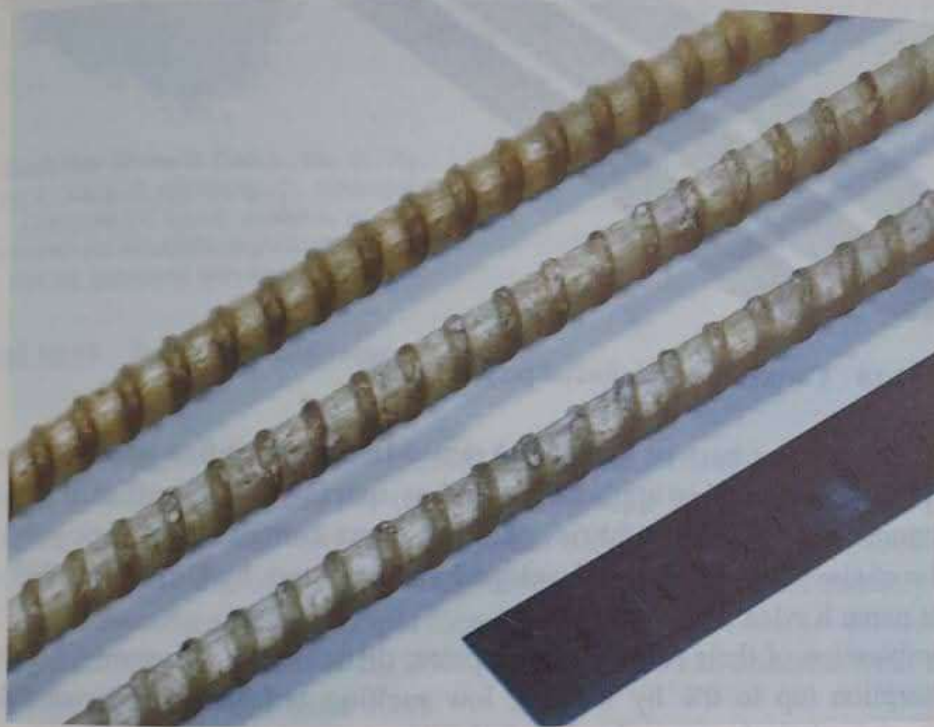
Glass fiber reinforced polymer rebar.
